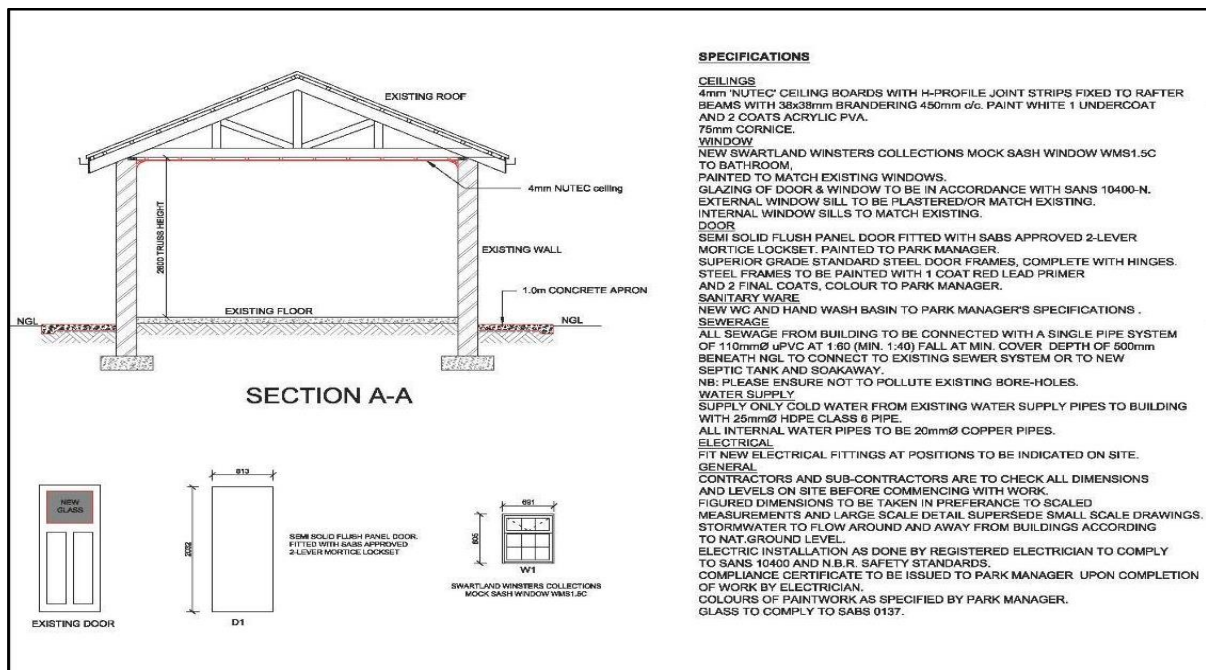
Swartfontein Outbuilding Section A-A MKNP-7/4/13/1/3 Rev 00
